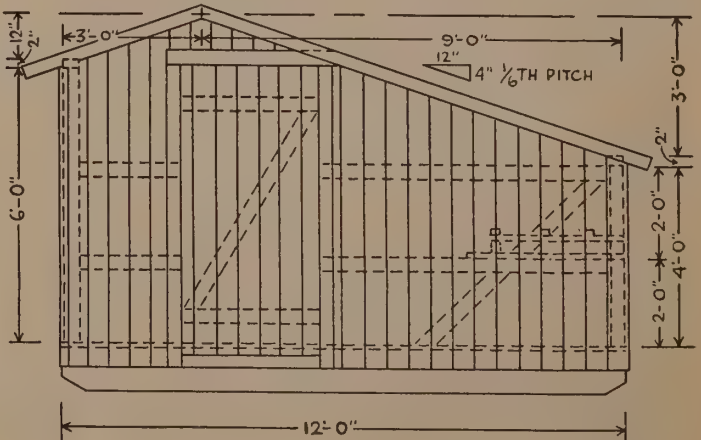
Side view showing framing, roosts and droppings boards. Insulation board can be used for the siding.
